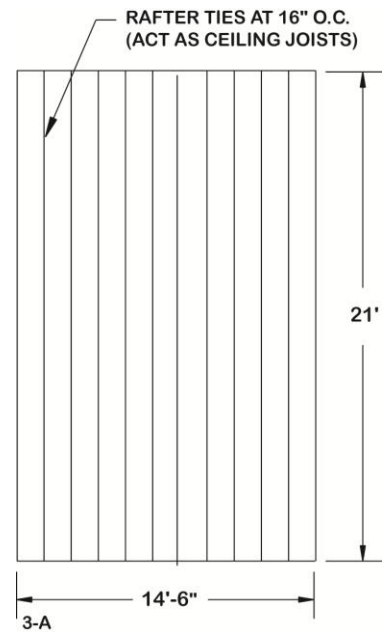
Roof and Ceiling Framing – Raised Ceiling Details
